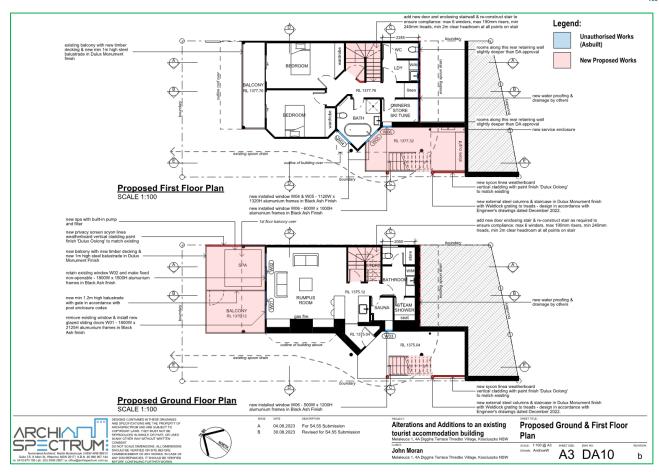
Ground Floor and First floor plans of Diggings Terrace.
